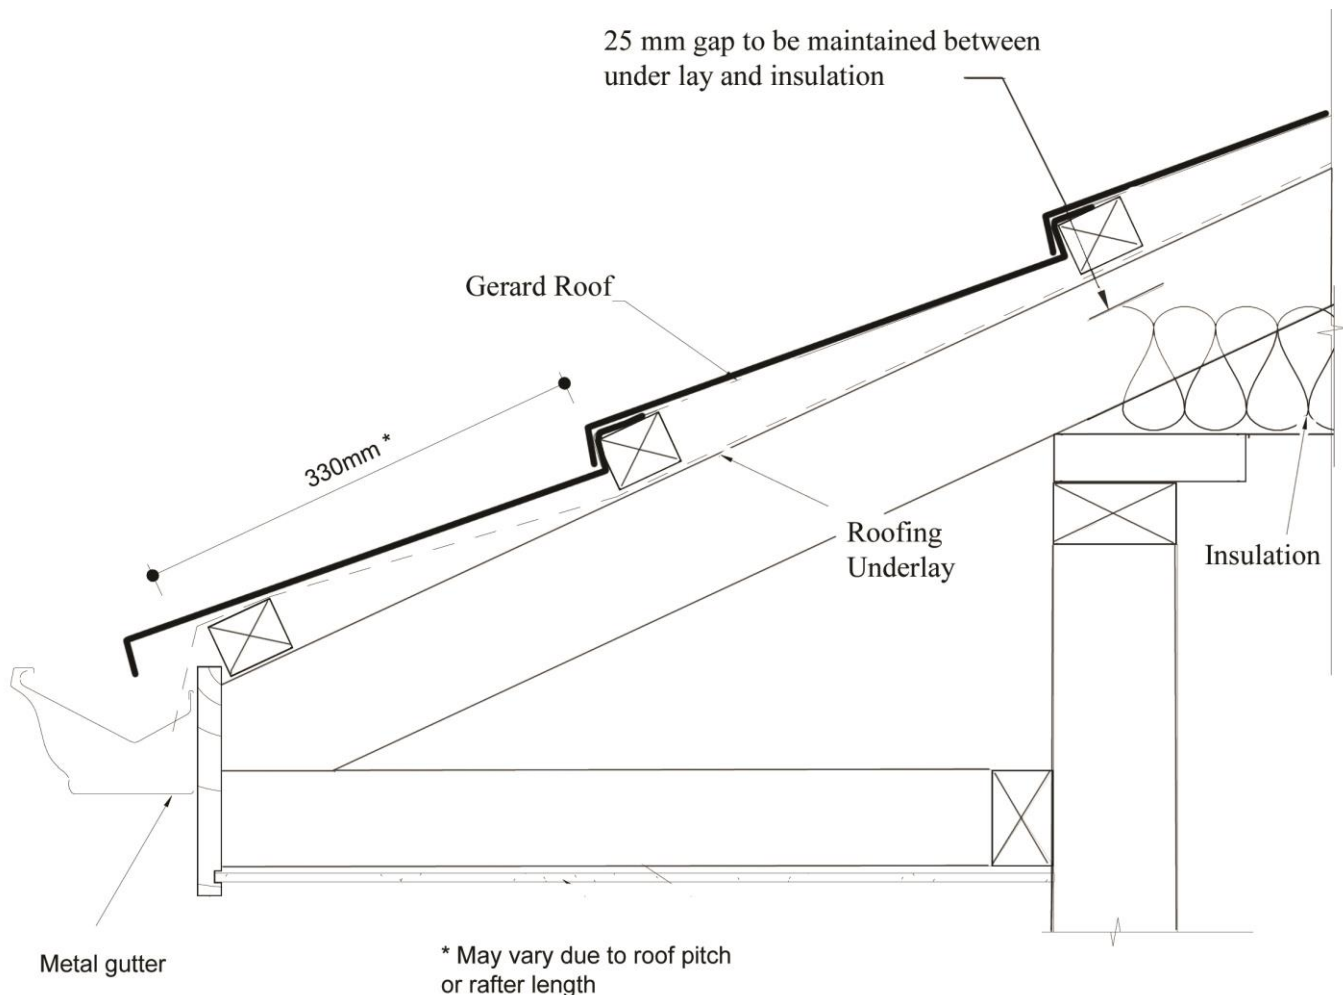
Roof, Roofing Underlay and Insulation location on a Rafter Roof.
